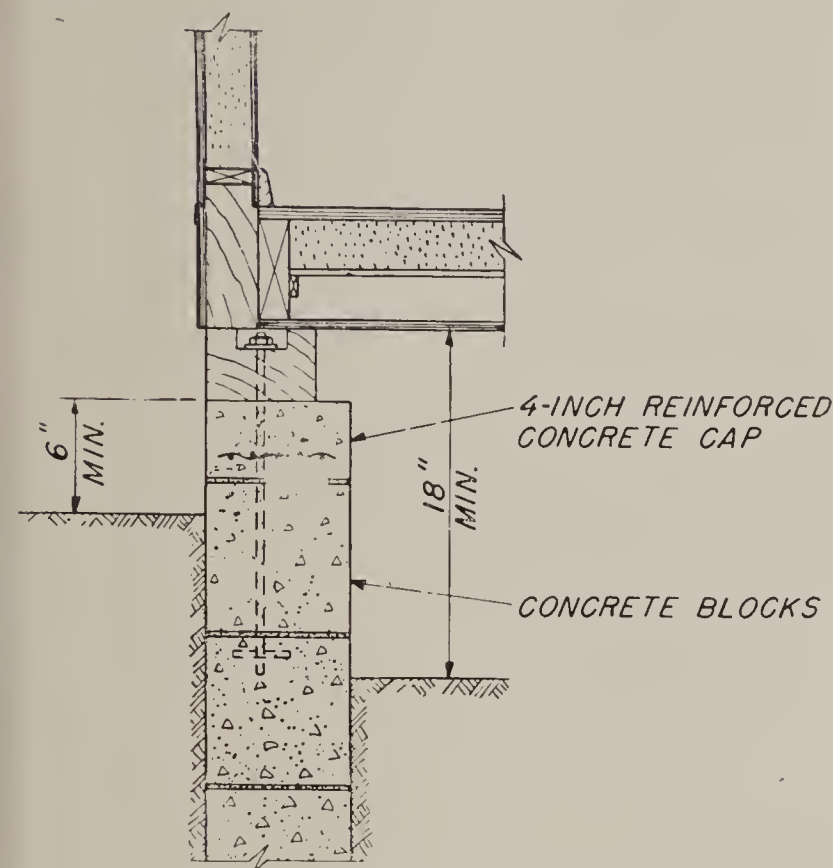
Reinforced poured concrete cap on masonry walls or piers to prevent hidden attack by termites. This cap should be at least 4 inches thick and must be poured in one continuous operation to avoid joints. Brick piers should have similar concrete caps. Minimum clearance of 18 inches under the building and 6 inches outside will allow inspection for moisture condensation or decay as well as for the presence of termite tubes or for possible cracking of the cap.
